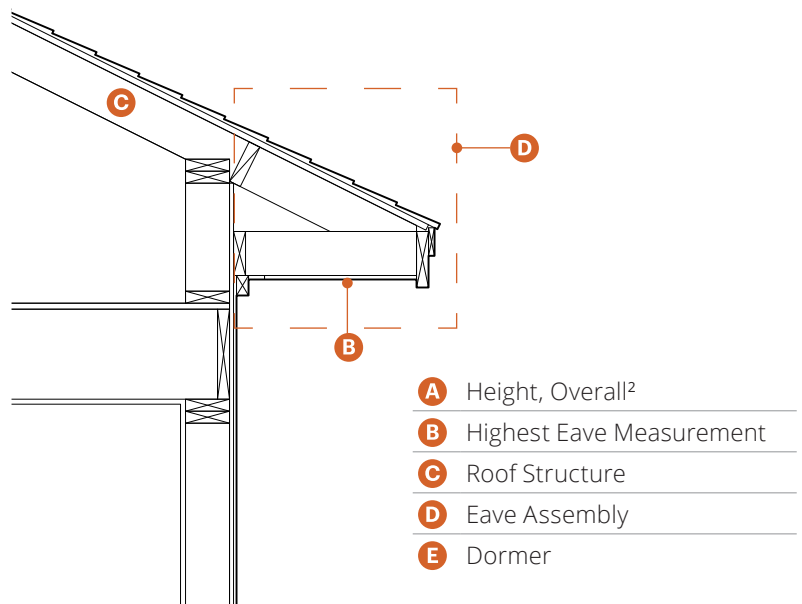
H: Section Detail of Highest Eave for Pitched Roof
